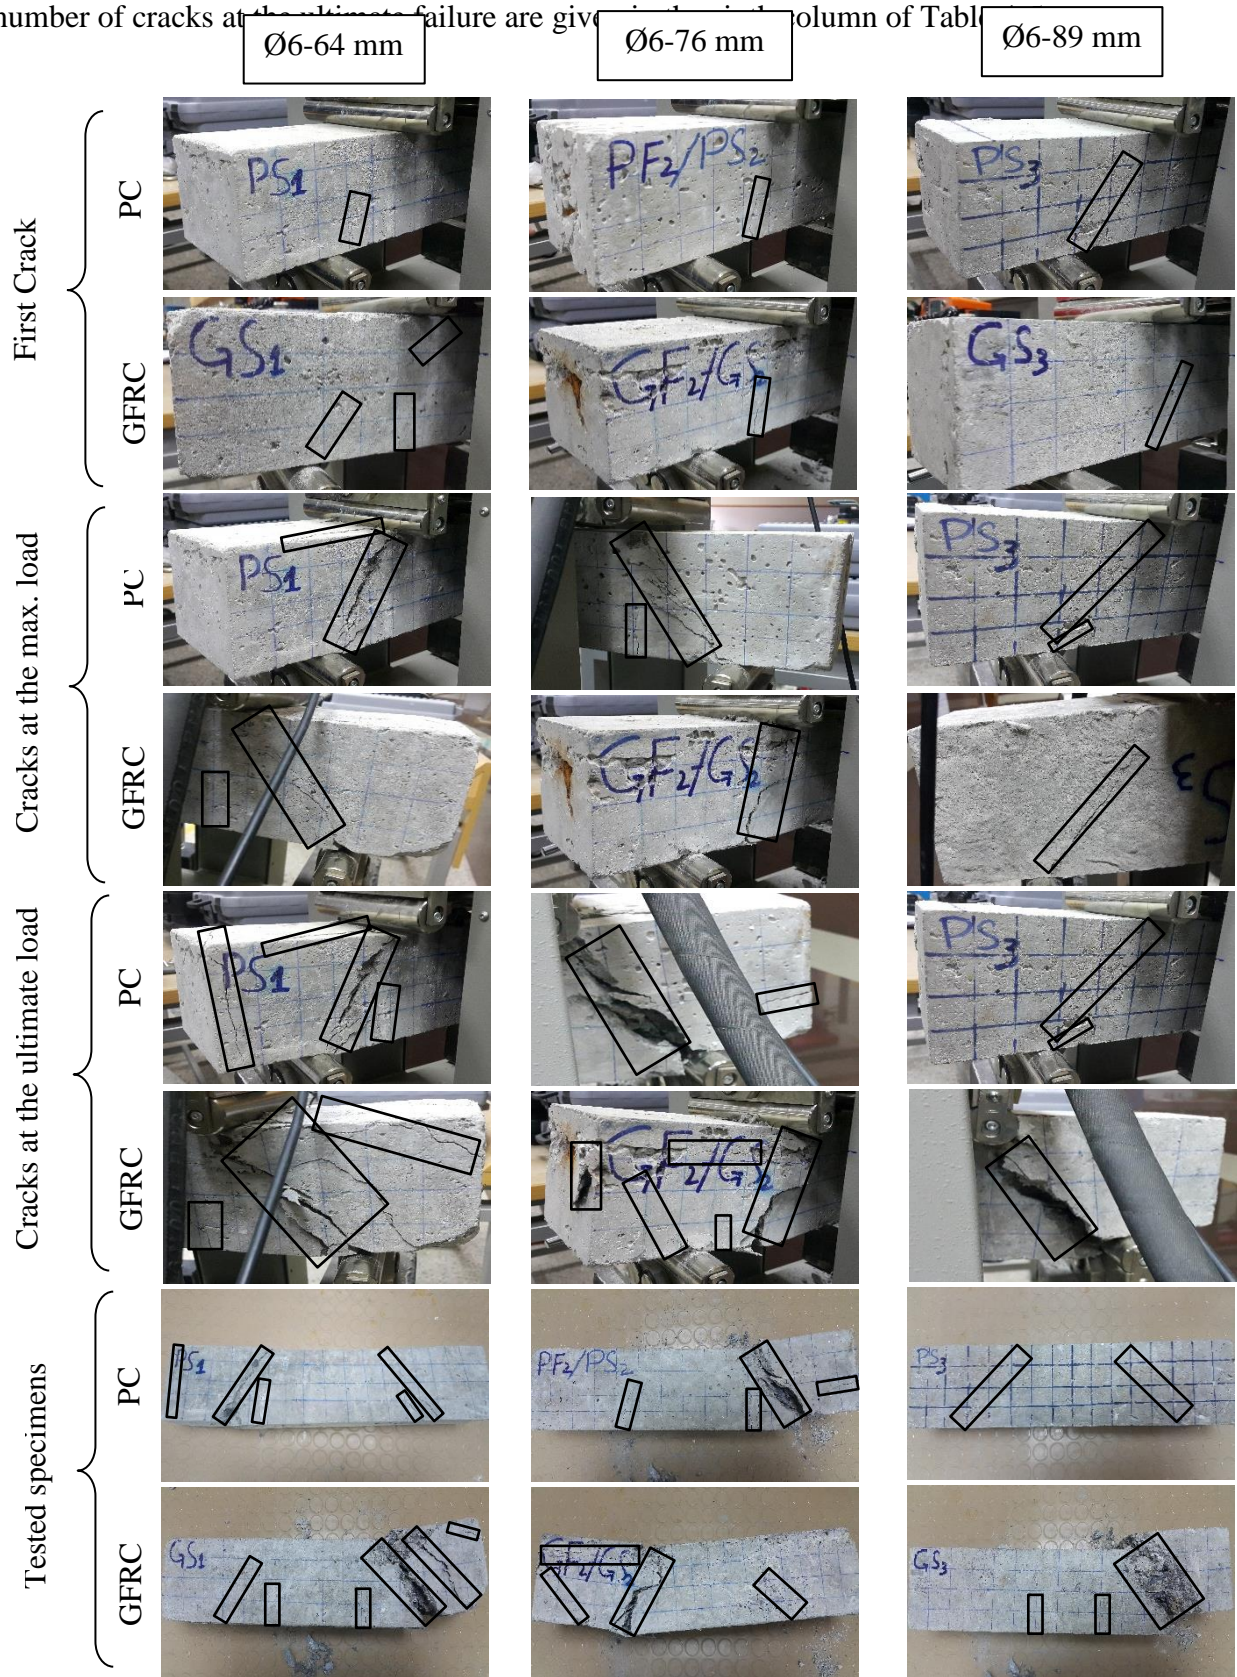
Behavior of specimens with varying shear reinforcement and constant flexural reinforcement (3-Ø6)
